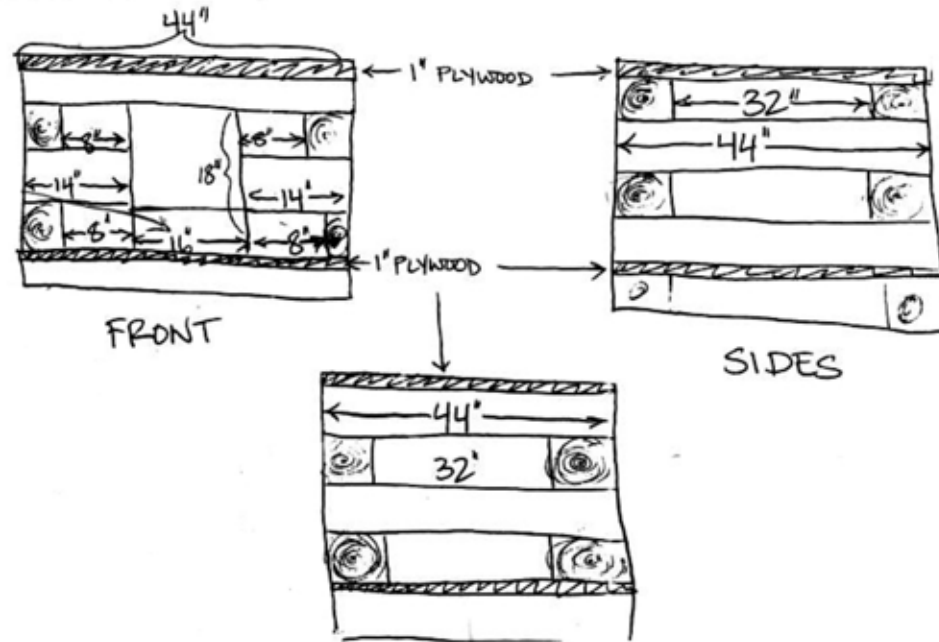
Building 105A, hand drawn sketch of current construction of dog houses used by the kennel staff (Denali Kennels Files)
